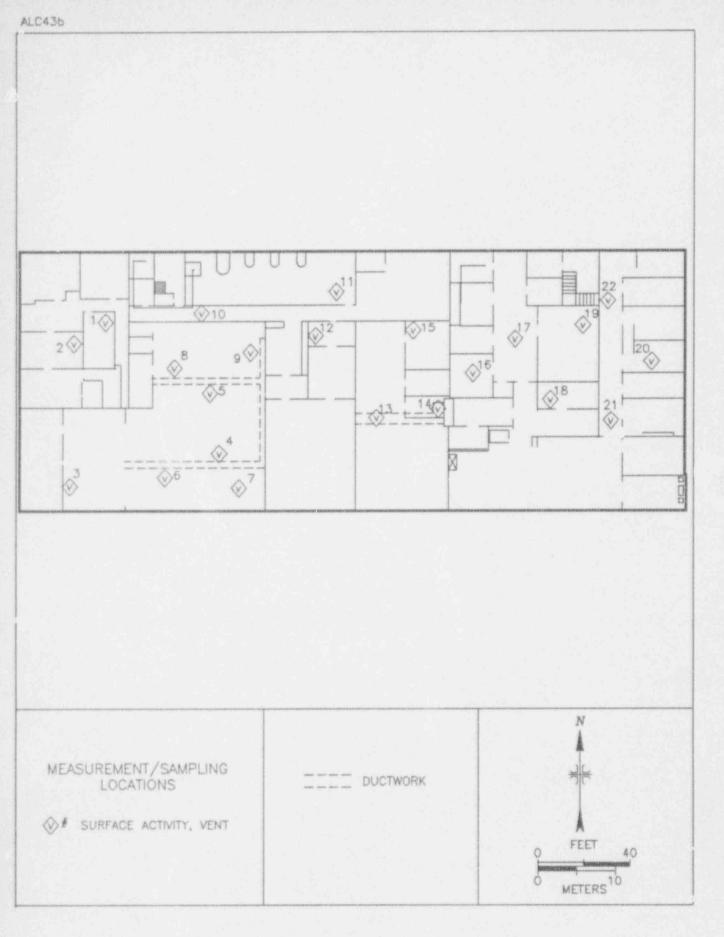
Building 65, First Floor Ventilation System Measurement and Sampling Locations
